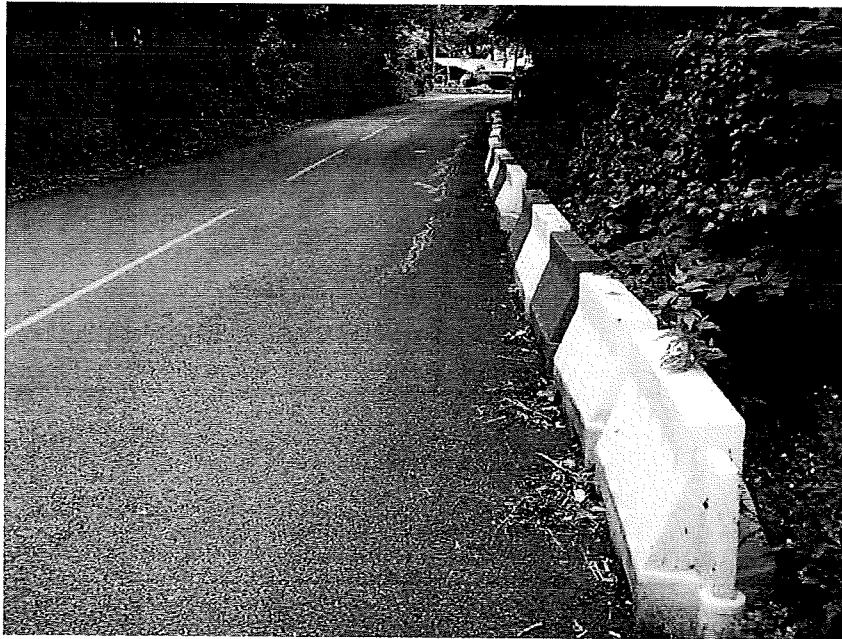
Localised cracking in westbound carriageway, Area 5 St Lawrence West
